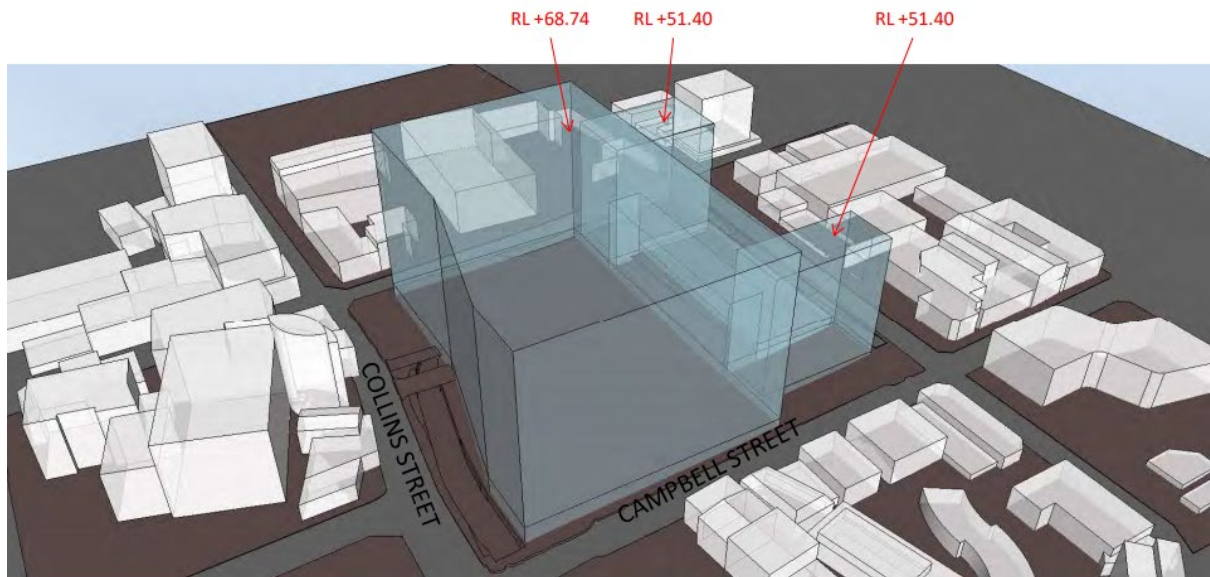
Building Envelope - three dimensional view 4
